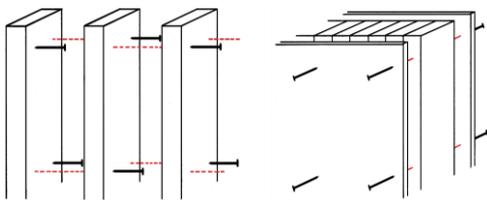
Nail laminated timber: NLT connection (left), sheathing connection (right)
